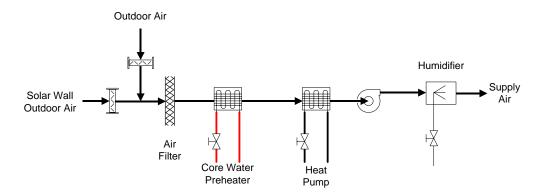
HVAC system diagram for the 3rd Precinct solar wall installation.
